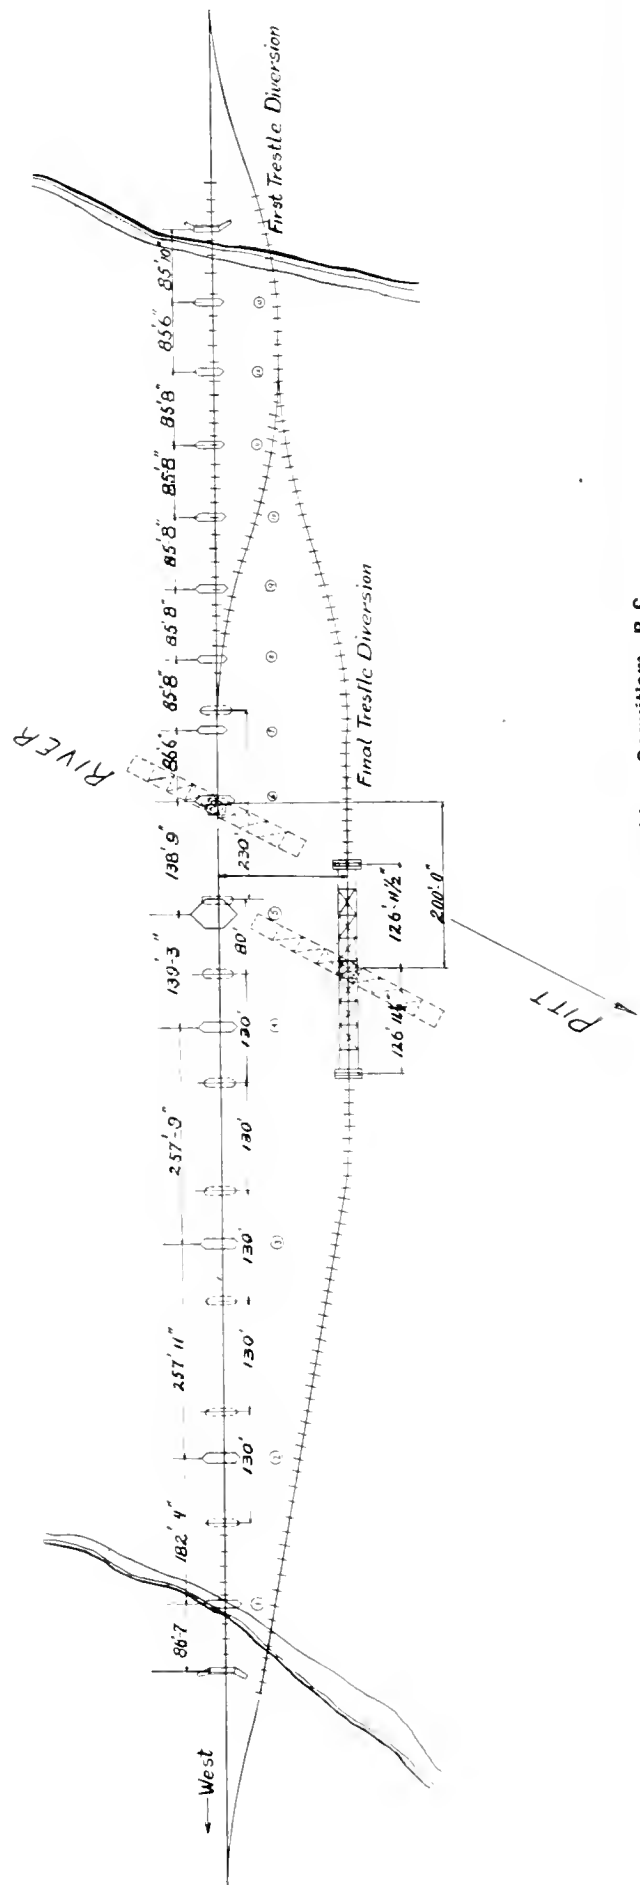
Layout of C.P.R. Pitt River Bridge, Coquitlam, B.C.
